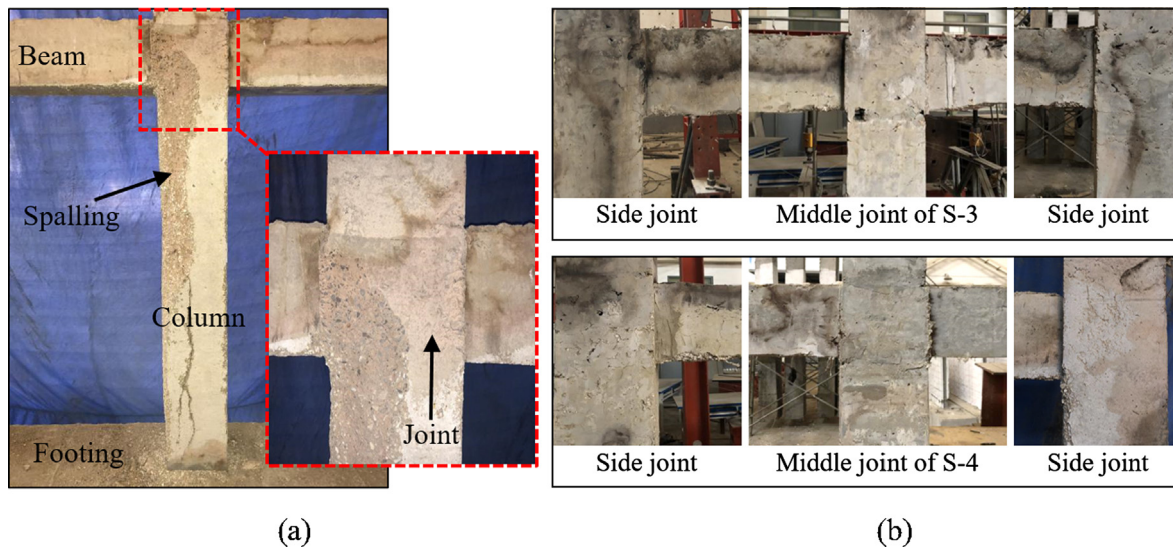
Photography of damaged specimens: (a) S-2 exhibits severe explosive spalling in fire; (b) S-3 and S-4 do not have spalling at the HPFRCC joints.
